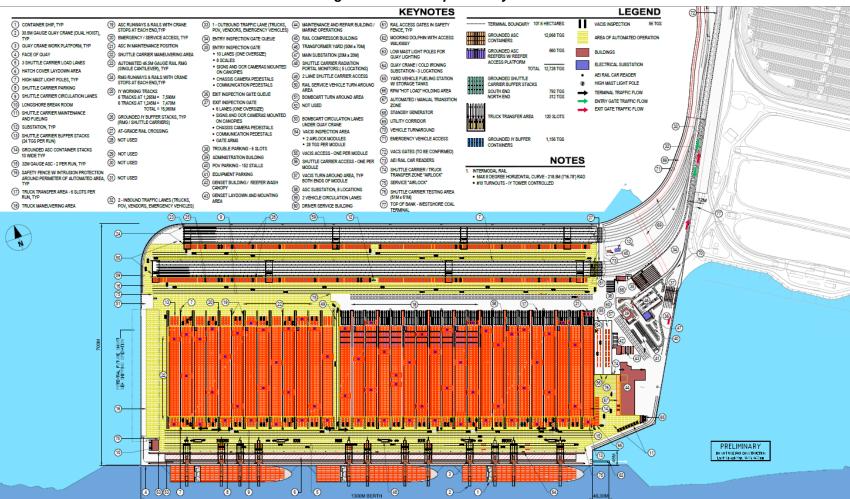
shows the preliminary proposed RBT2 site layout. Key features of the site include:
